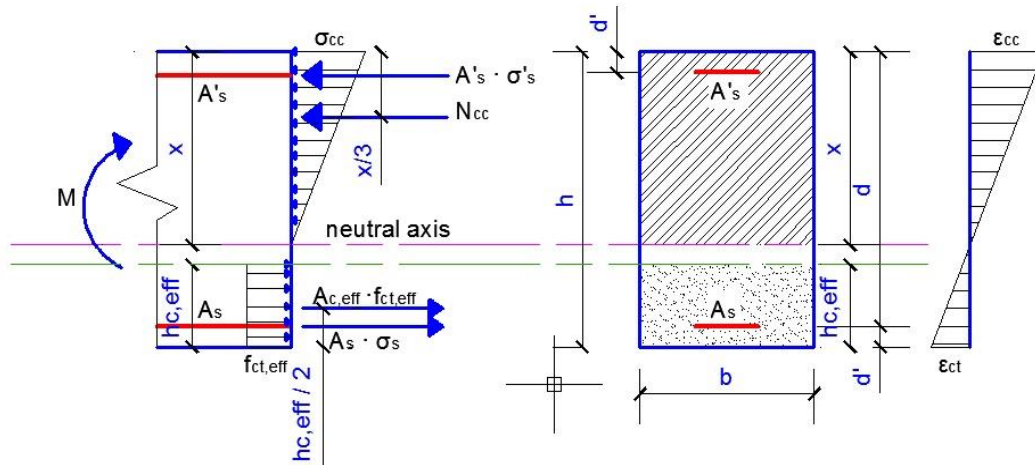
The stressed and deformed state of a reinforced concrete element in bending, with rectangular cross – section
